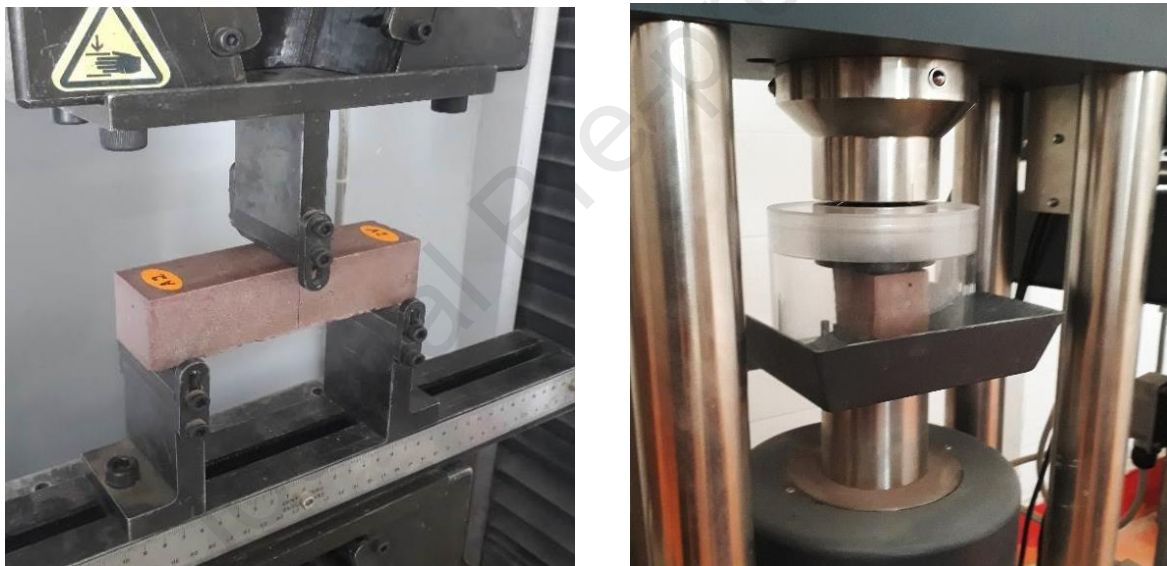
Mechanical tests; a) Three-point flexural test; b) Compressive test
